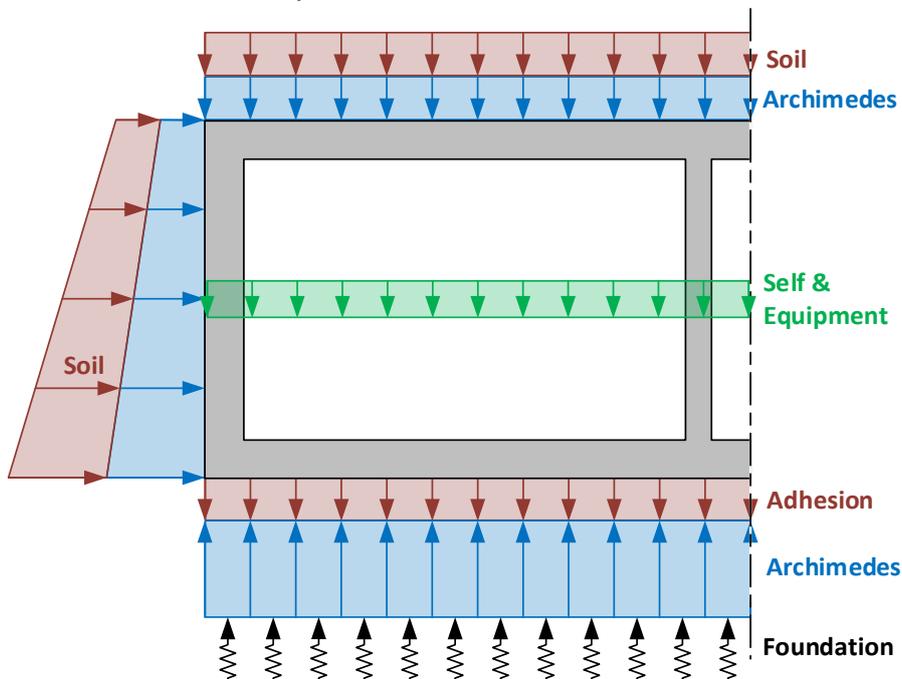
, CROSS-SECTION VIEW INCLUDING LOADS
